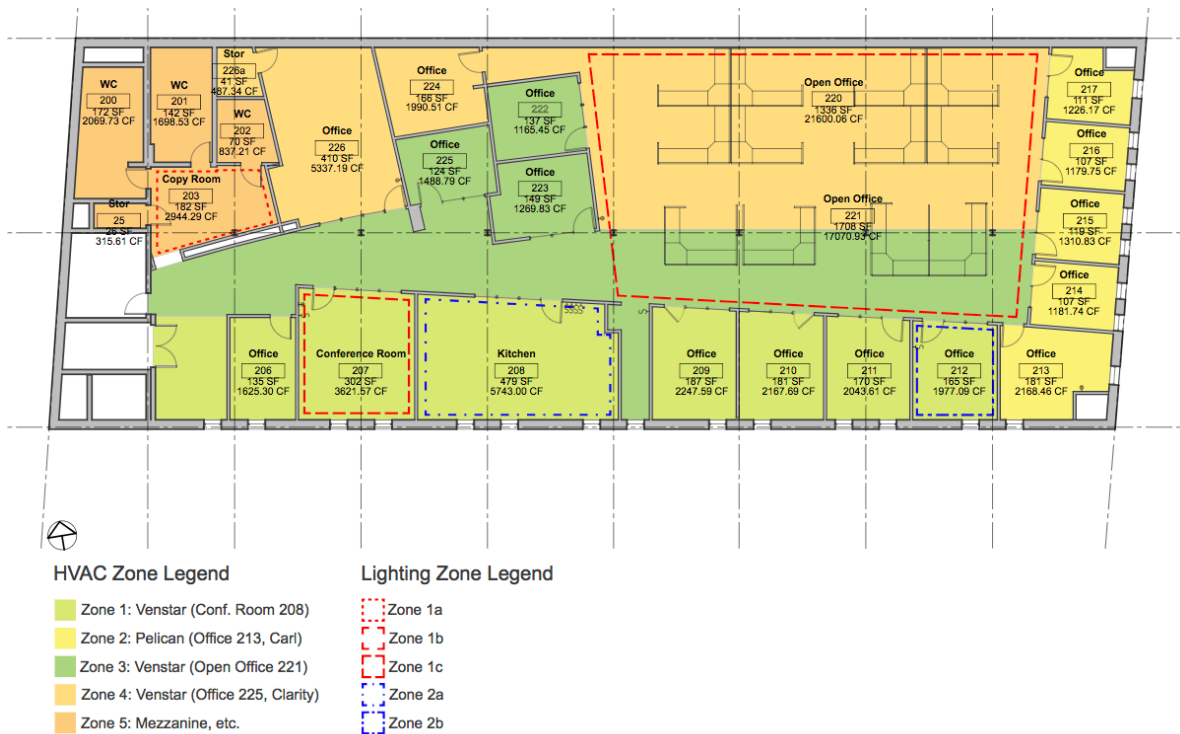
Floor plan of CIEE offices showing the HVAC and lighting zones.
